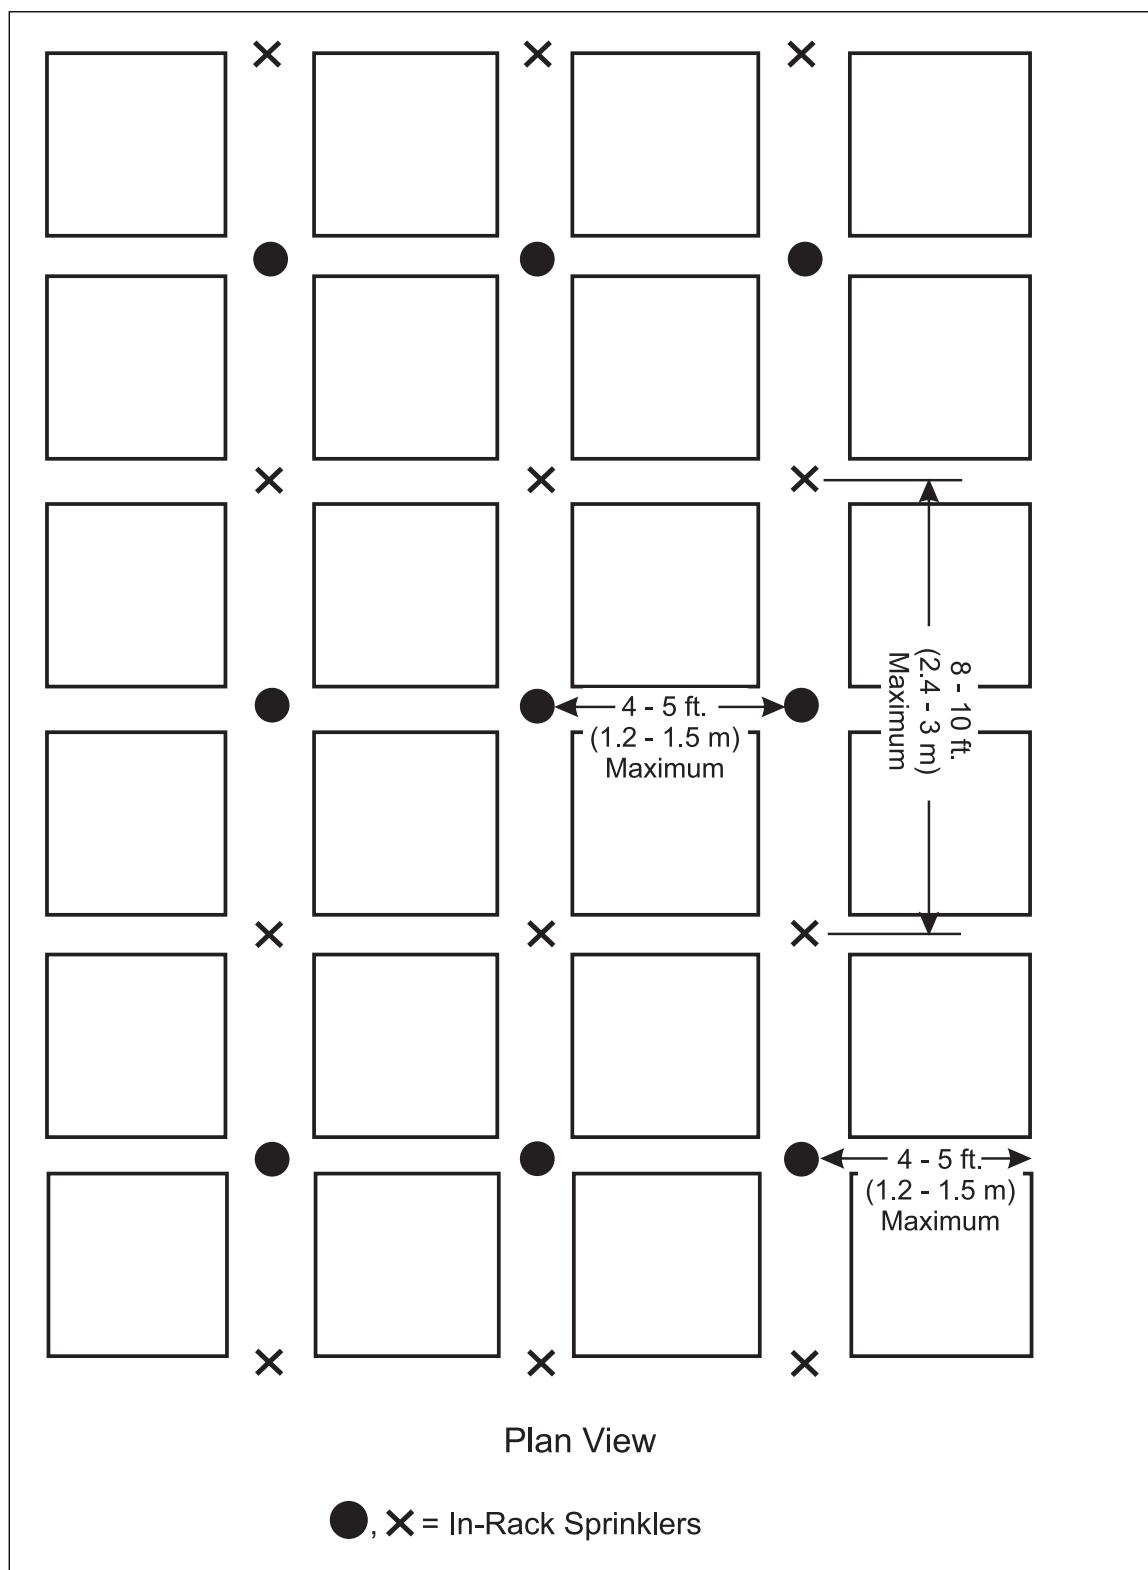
Multiple-row rack sprinkler layout: quick response sprinklers protection scheme (plan view)
